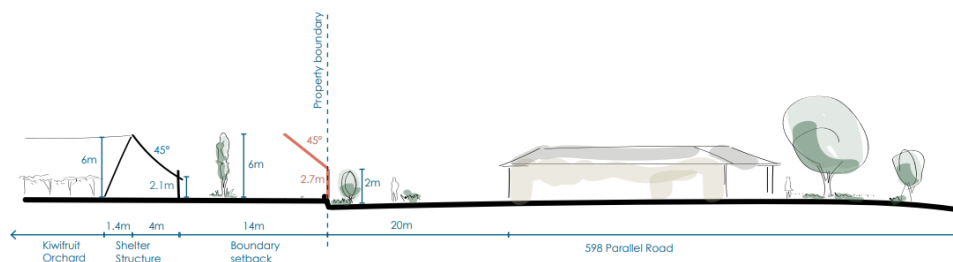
Southern Elevation Plan with Shelter Belt Planting Shown and HIRB
